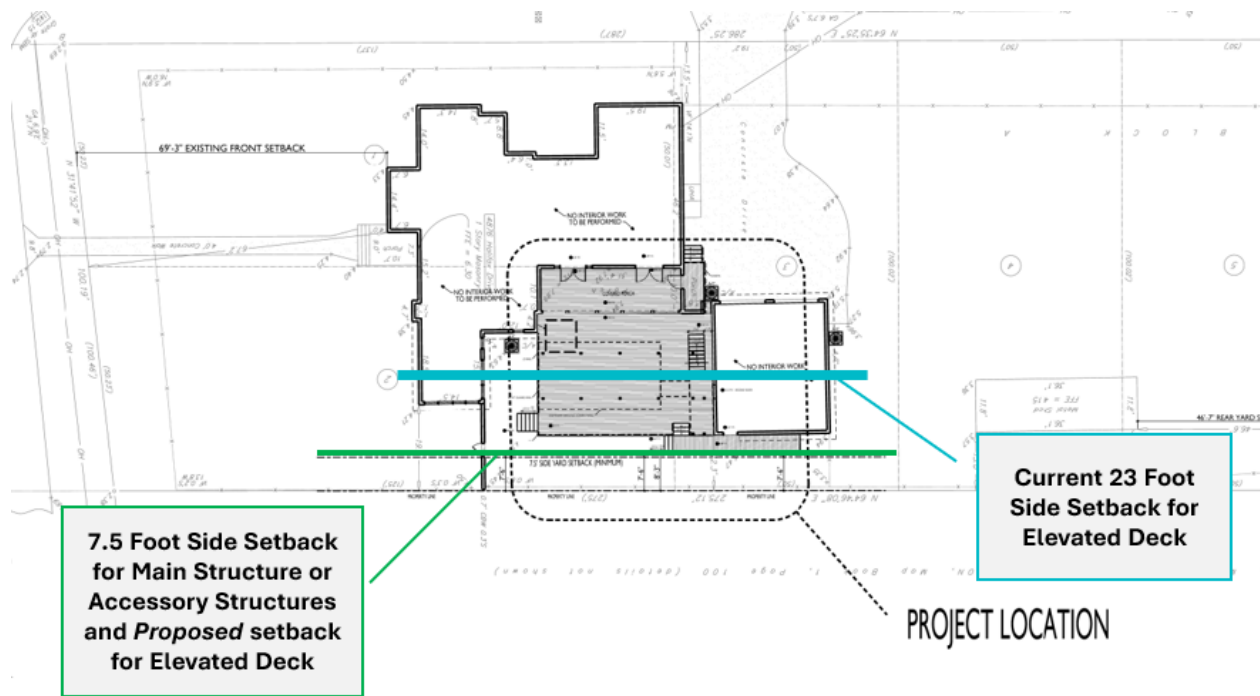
Site Layout for a 10-foot elevated deck with the current setback (blue) and the proposed setback (green)
